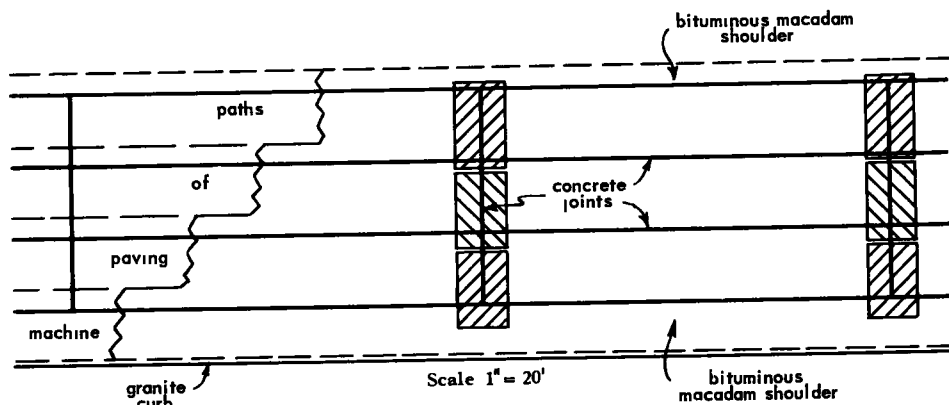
Placement of fabric on road. Transverse joint reinforcing with sheet fabric.
